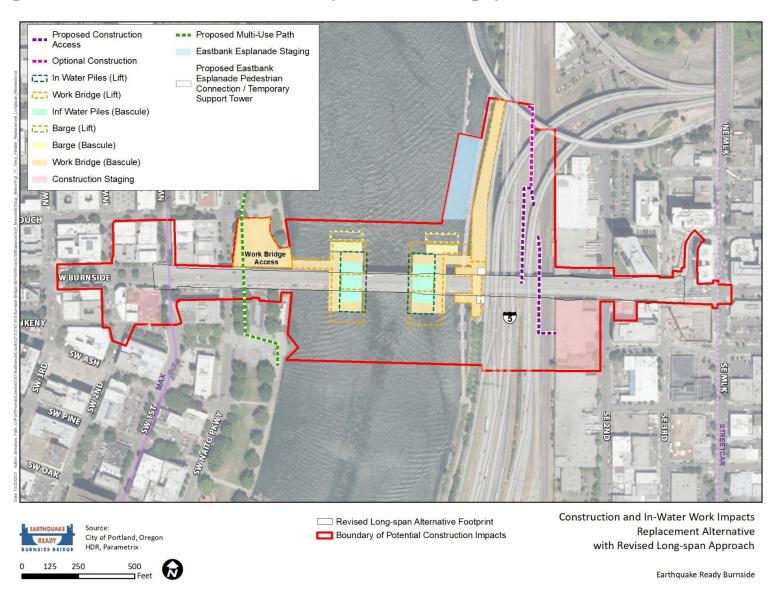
Construction and In-Water Work Impacts – Refined Long-Span Alternative
